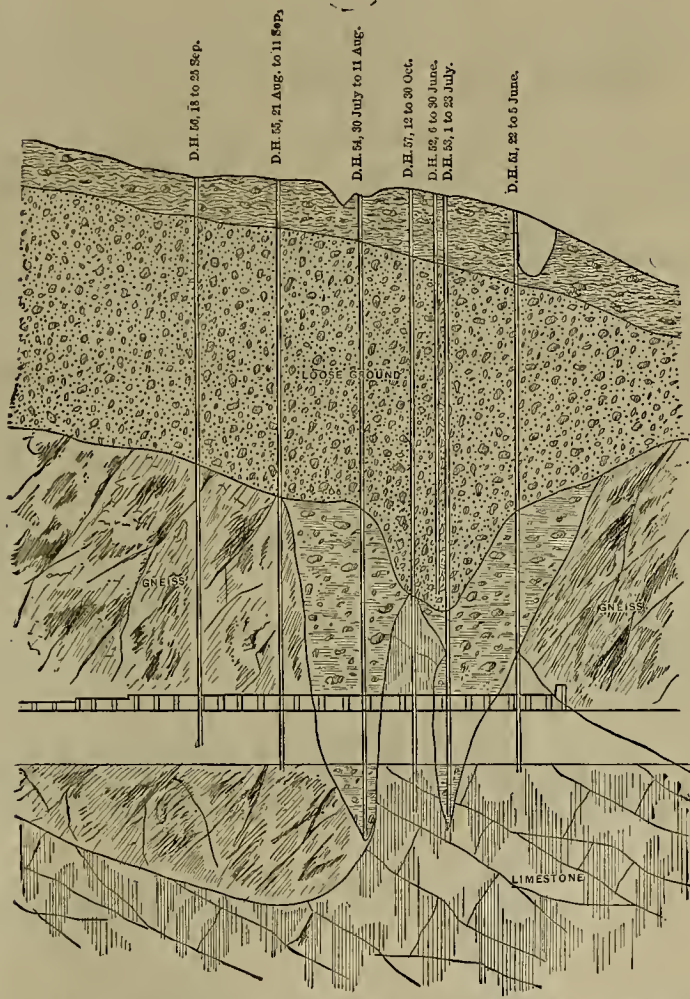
SECTION BETWEEN SHAFTS 13 AND 14, AS SHOWN BY DRILL-HOLES.
